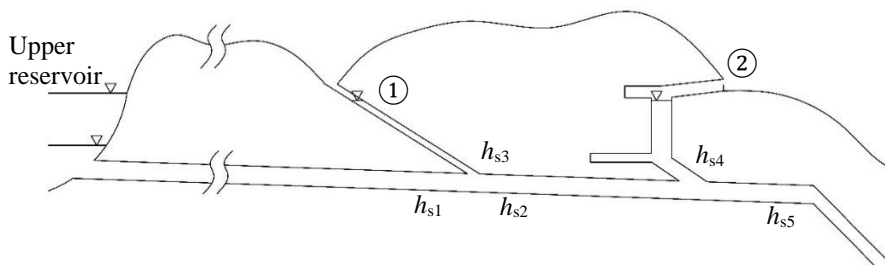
Minor head loss parameters distribution on relevant tunnel stretches
